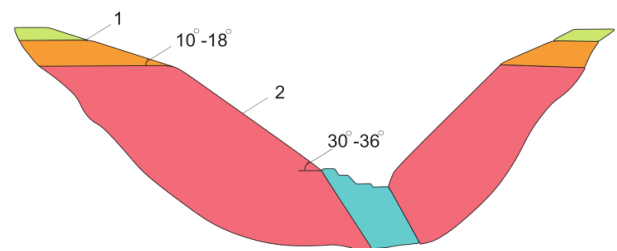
Structure of the deep open pit wall: 1 – open pit wall at the upper levels; 2 – open pit wall at the lower levels
